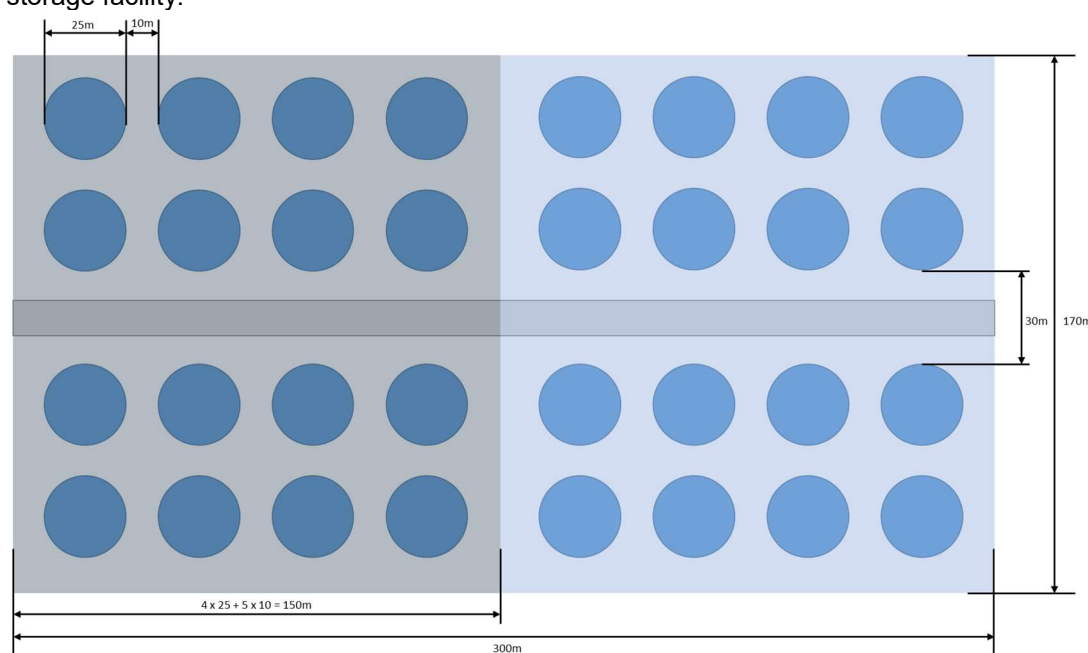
Minimum plot space and arrangement required for placing above ground LPG storage
